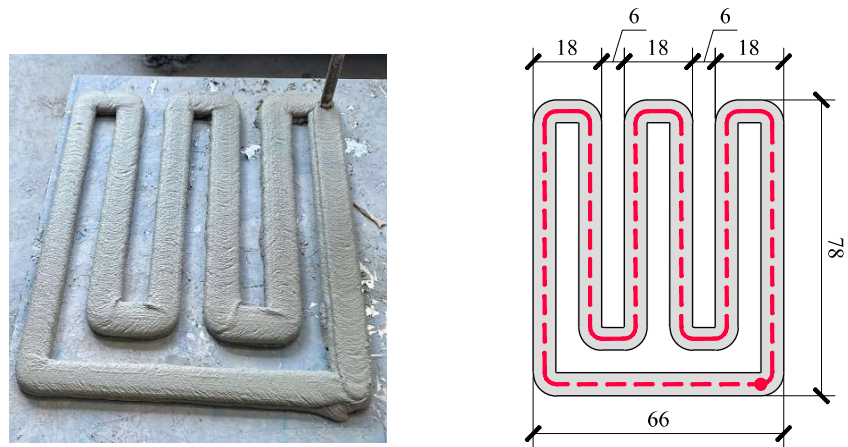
Companion specimen of the wall: plan view with measures. Measures in centimetres.
